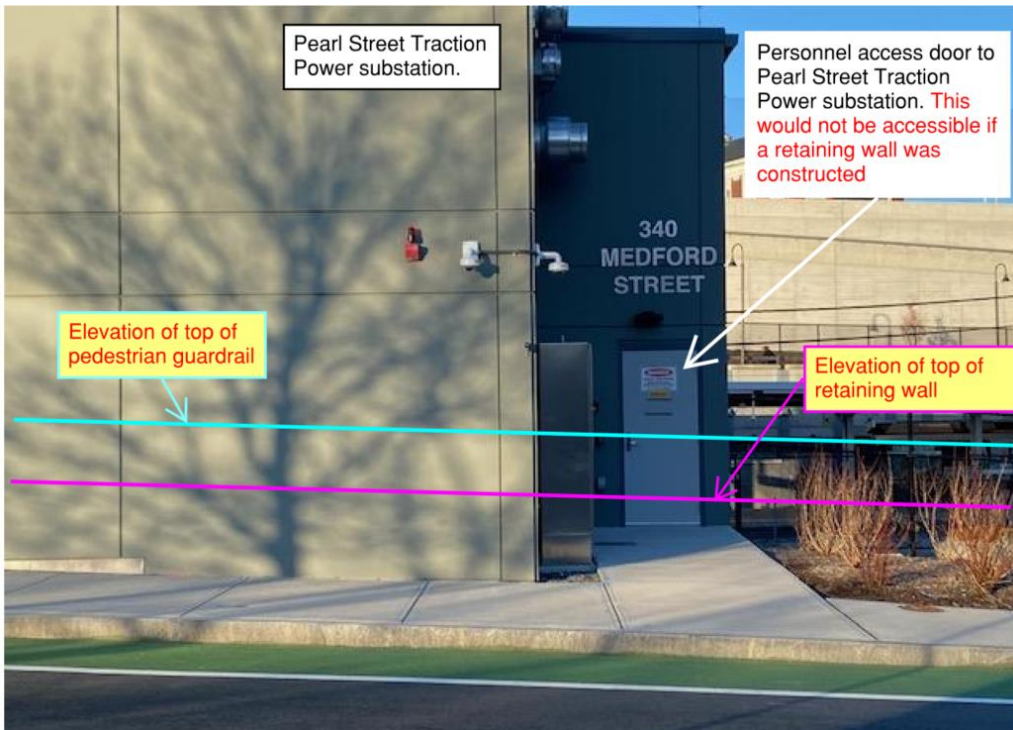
Medford Street facing the MBTA PSTPSS personnel access door
